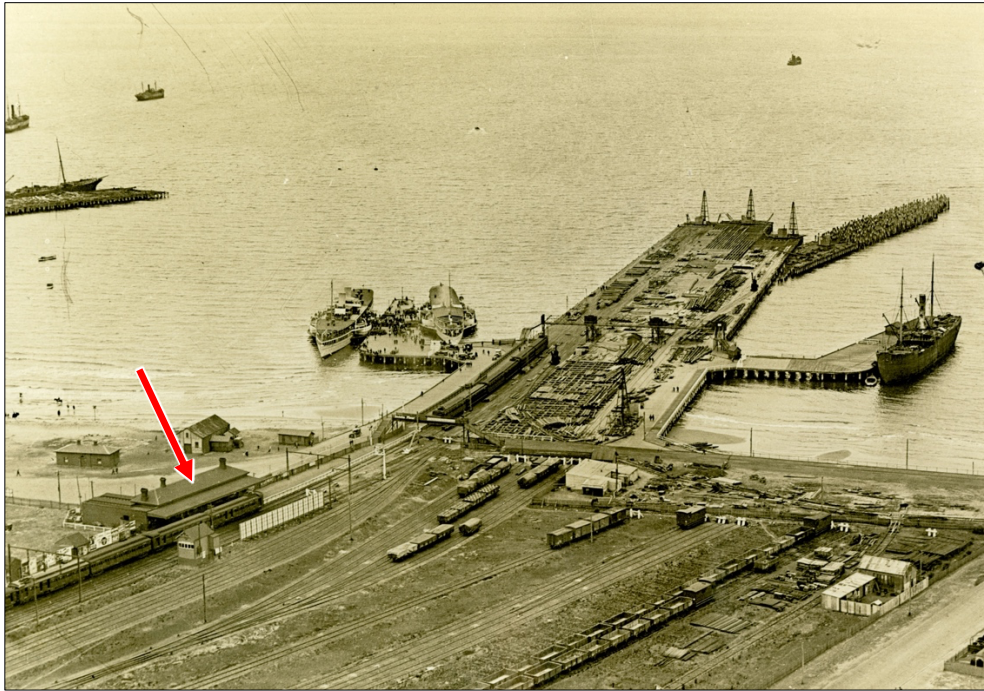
A 1925 oblique aerial of Station Pier under construction. Port Melbourne Railway Station is visible to the lower left of the image. Image Source: Public Record Office Victoria.
